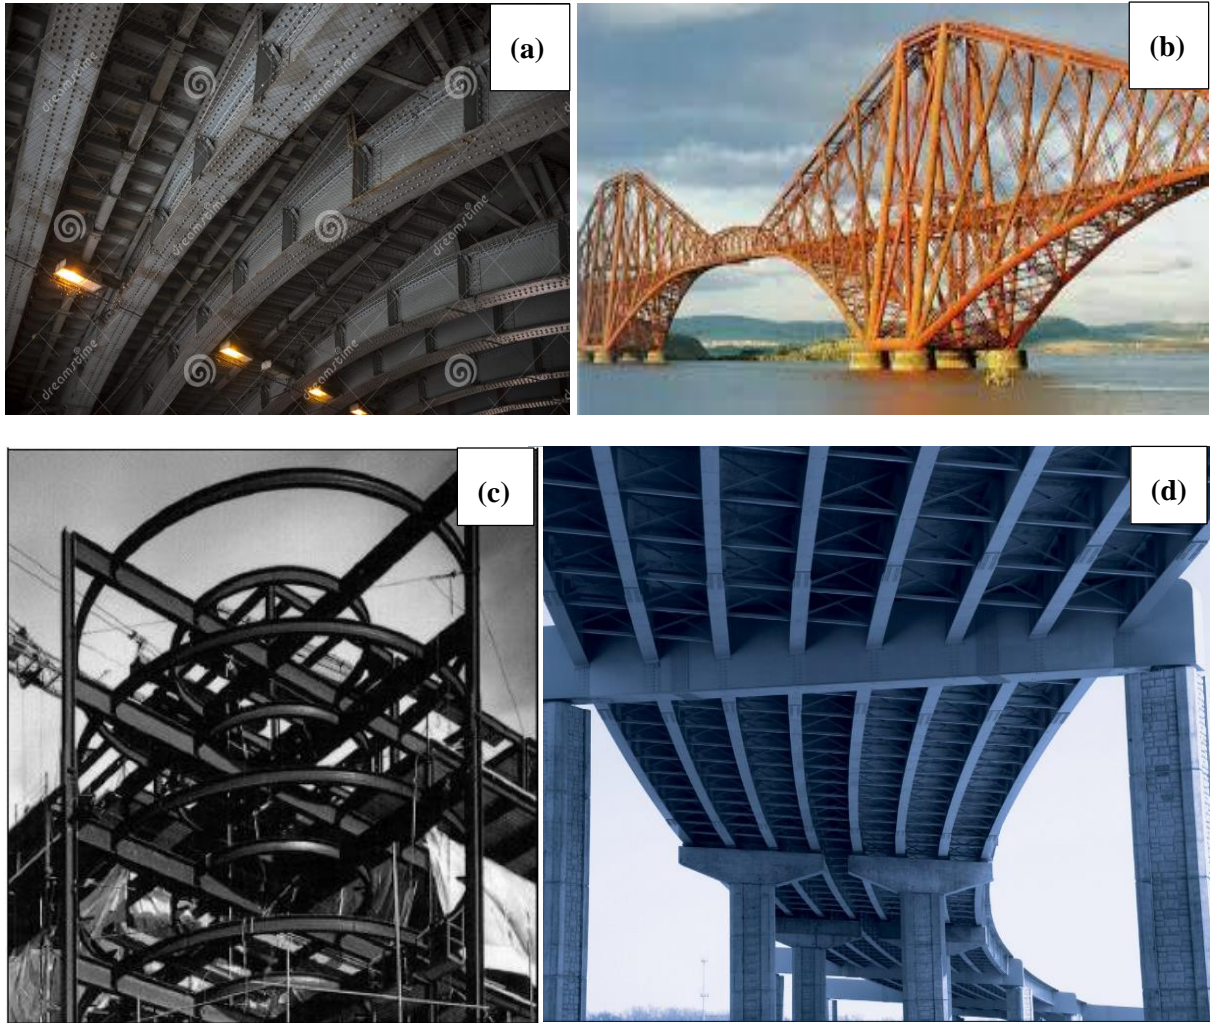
Applications of vertically and horizontally curved steel beams, (a) vertically curved roof I-beams; (b) Vertically curved tubular beams in a bridge; (c) horizontally curved floor beams; and (d) horizontally curved I-beams in a highway bridge (Wardnier, 2001).
